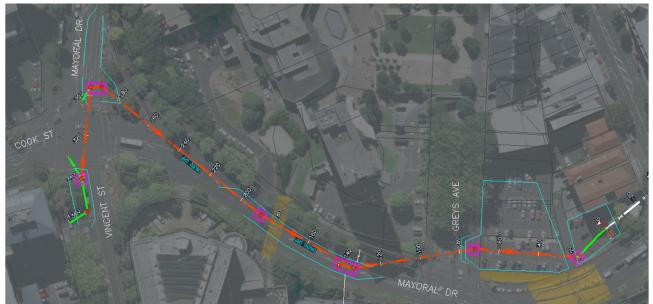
Main Construction Works Overview (orange lines are trenchless pipelines, green are trenched pipelines)
